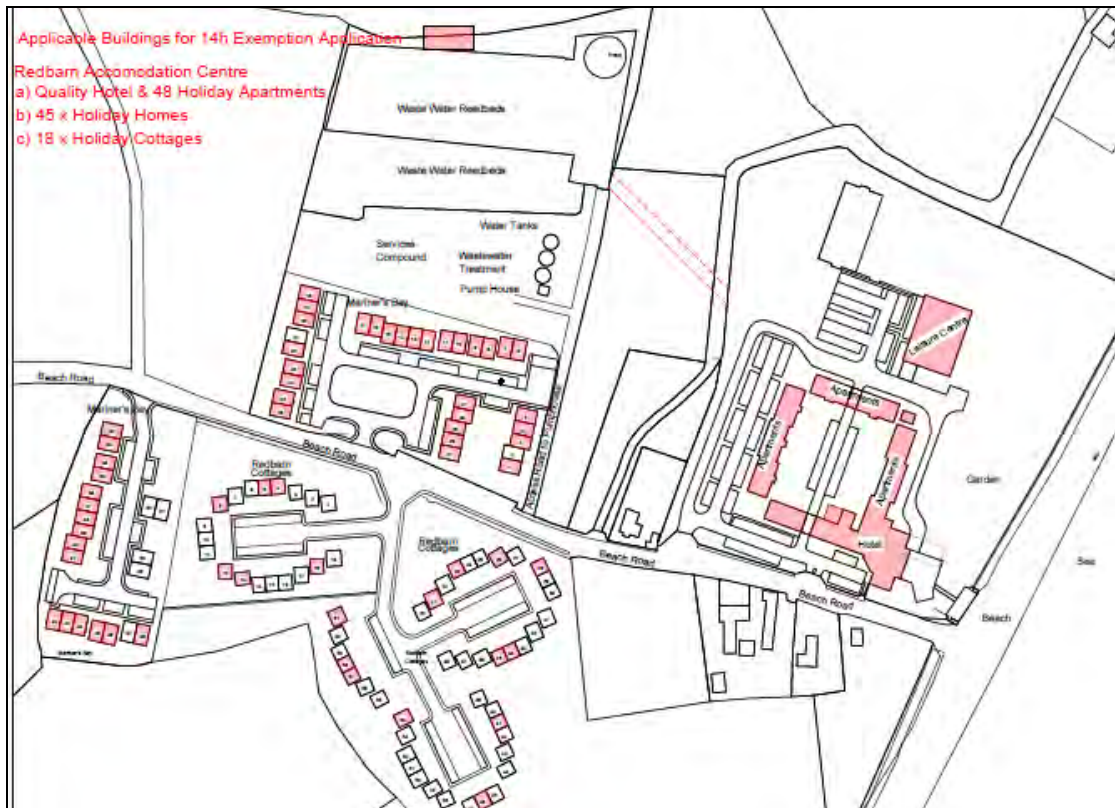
Extract from Site Layout Plan – structures made in red are applicable to this Section 5 Declaration application. Note that the lesiure centre does not form part of this application.
